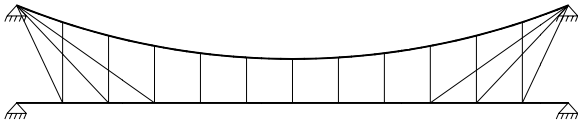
Suspension bridge stabilization by application of inclined additional cables
